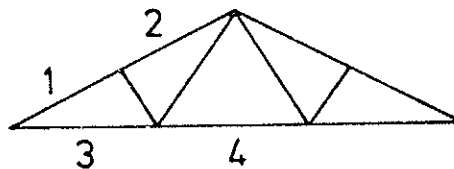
Moment coefficients for different roof slopes and slips in the connections. Large eccentricity in the Ridge Connection, $DHRIDGE = 0.25 = 1/4$.
